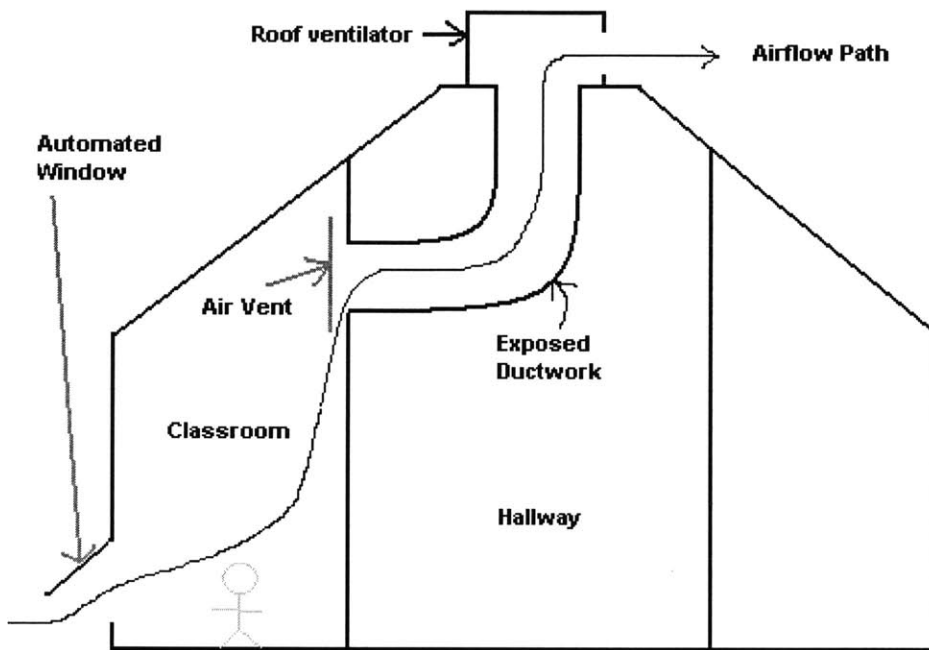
Schematic of airflow path. Air enters from the outside and is heated by interior sources. The air rises towards the ceiling into ducts that run to fan-assisted stacks located on the roof.
